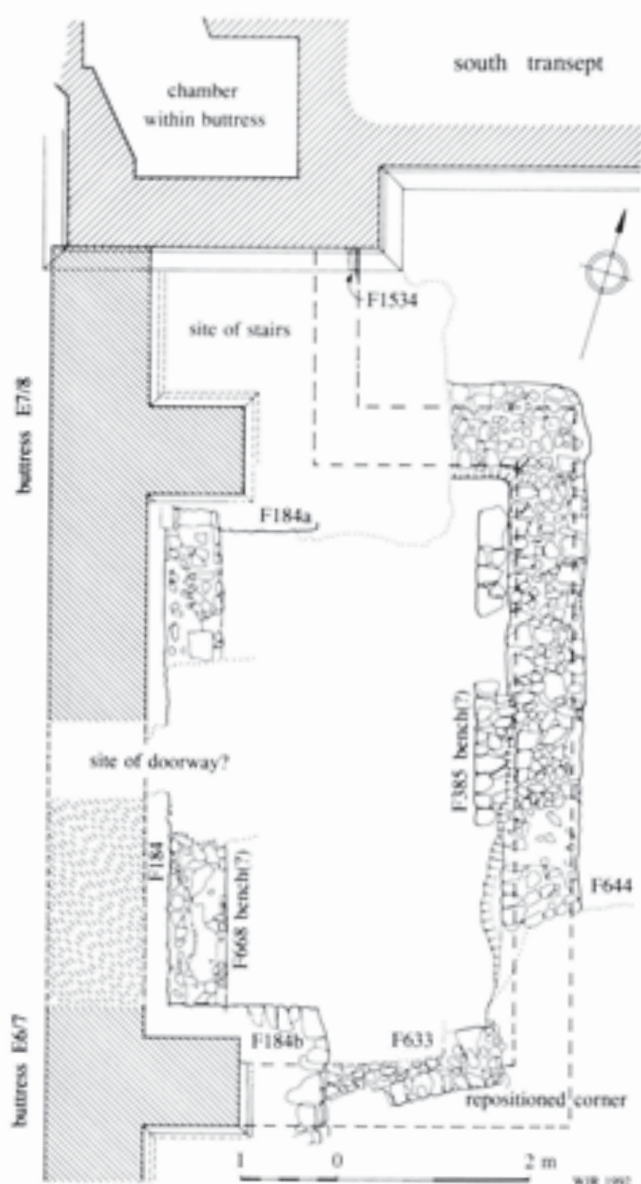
Foundation plan of Structure 12 (office?) in Area 7, adjoining cloister bay E₇. The heavy broken line indicates the position of the primary superstructure. The canting of the south wall (F633) is secondary. Scale 1:80
